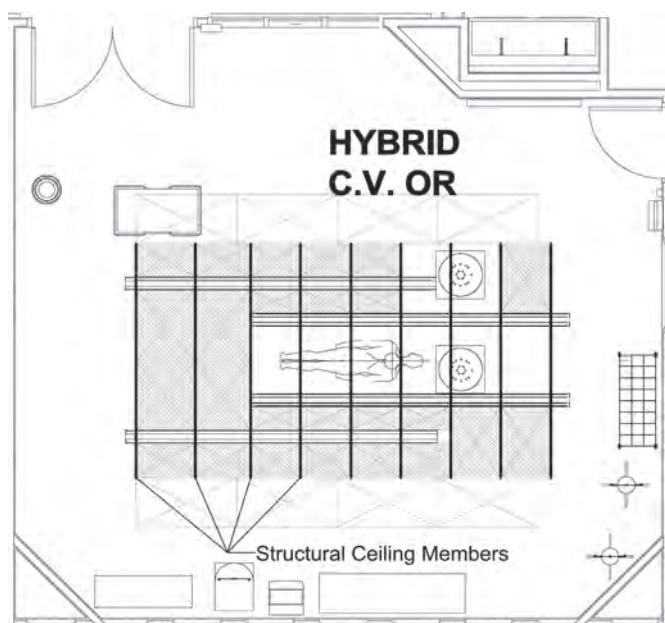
Ceiling-mounted equipment is suspended from structural members that are incorporated into the monolithic ceiling or integrated ceiling system. The location and spacing of these members prevents use of standard sized diffusers offered by HVAC manufacturers, but early coordination with the HVAC equipment manufacturers allows custom sized unidirectional diffusers to be designed. Use of custom sized diffusers (shaded in Figure 5) shrinks the non-diffusers space within the array, minimizing the overall array size...
